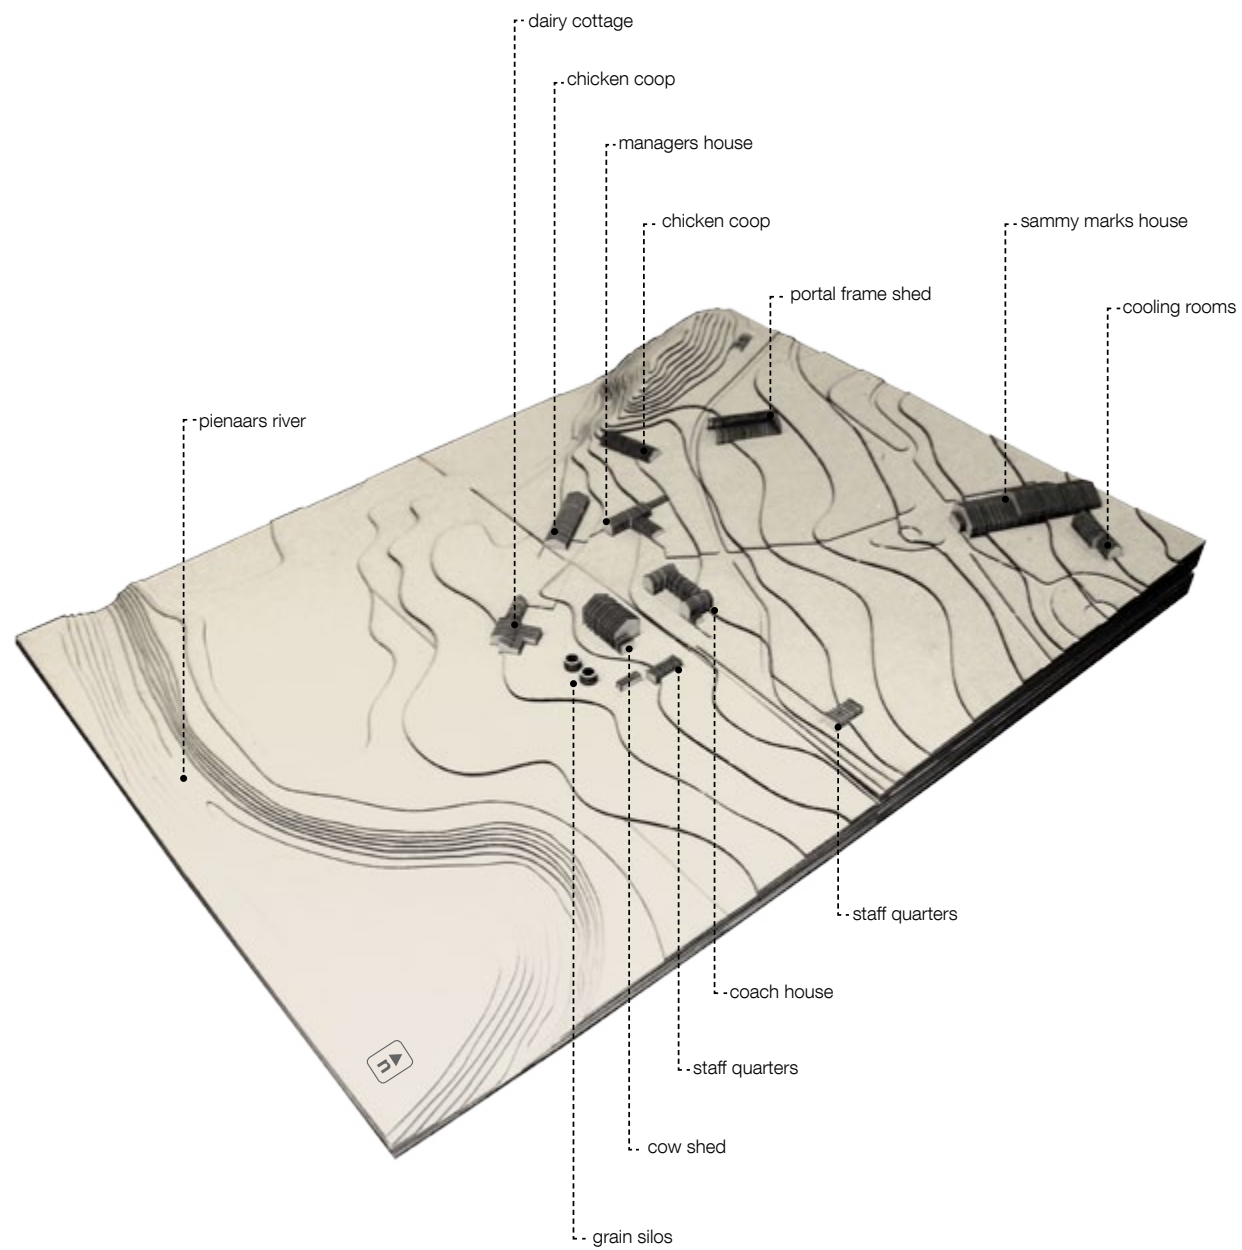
Site Model - Existing built fabric & their original functions (Author: 2012)
